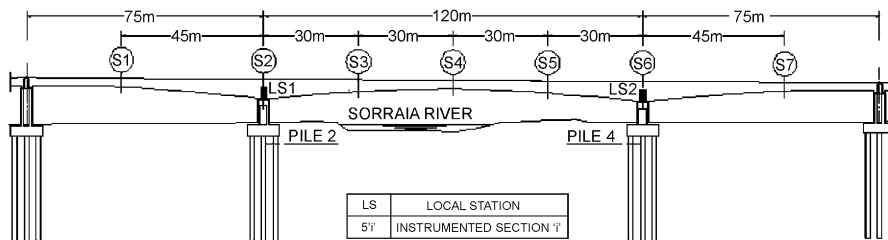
Instrumentation plan of Sorraia River Bridge.
